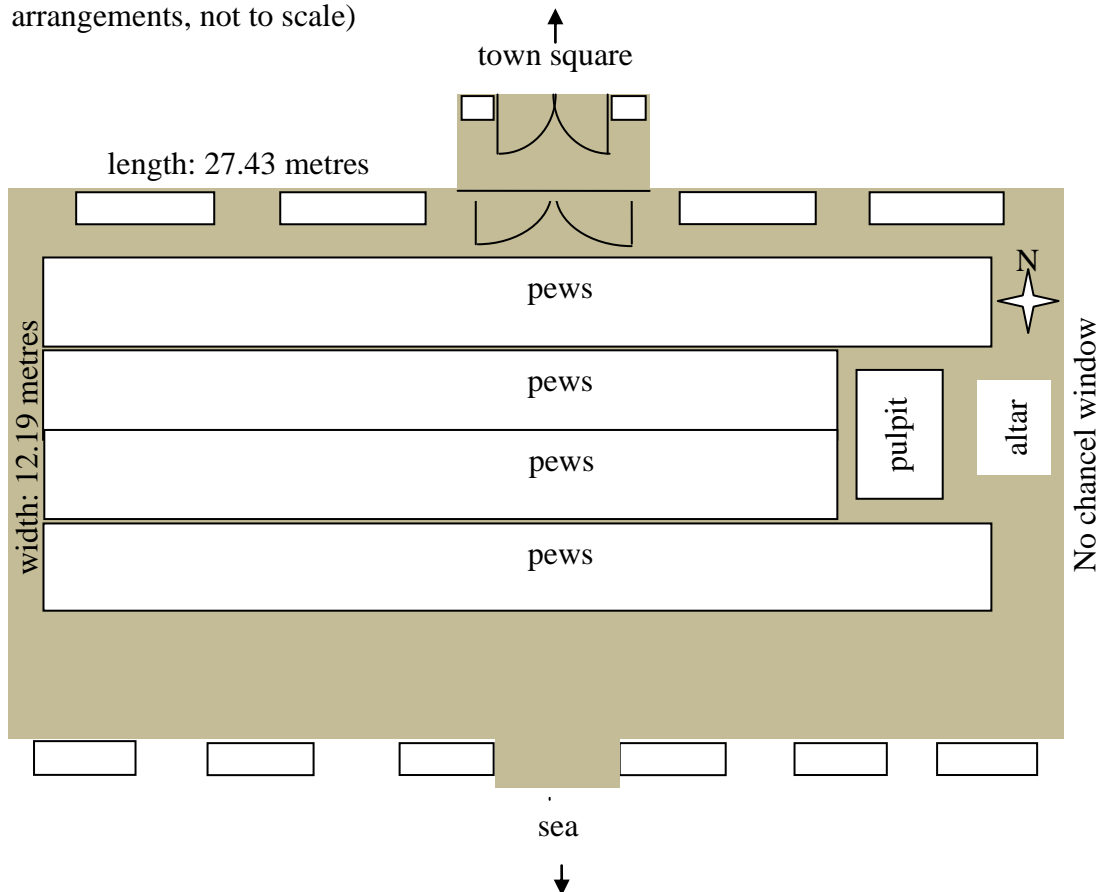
1826 St Mary's Castletown floor plan 1957 (Thompson 1964: 13)
